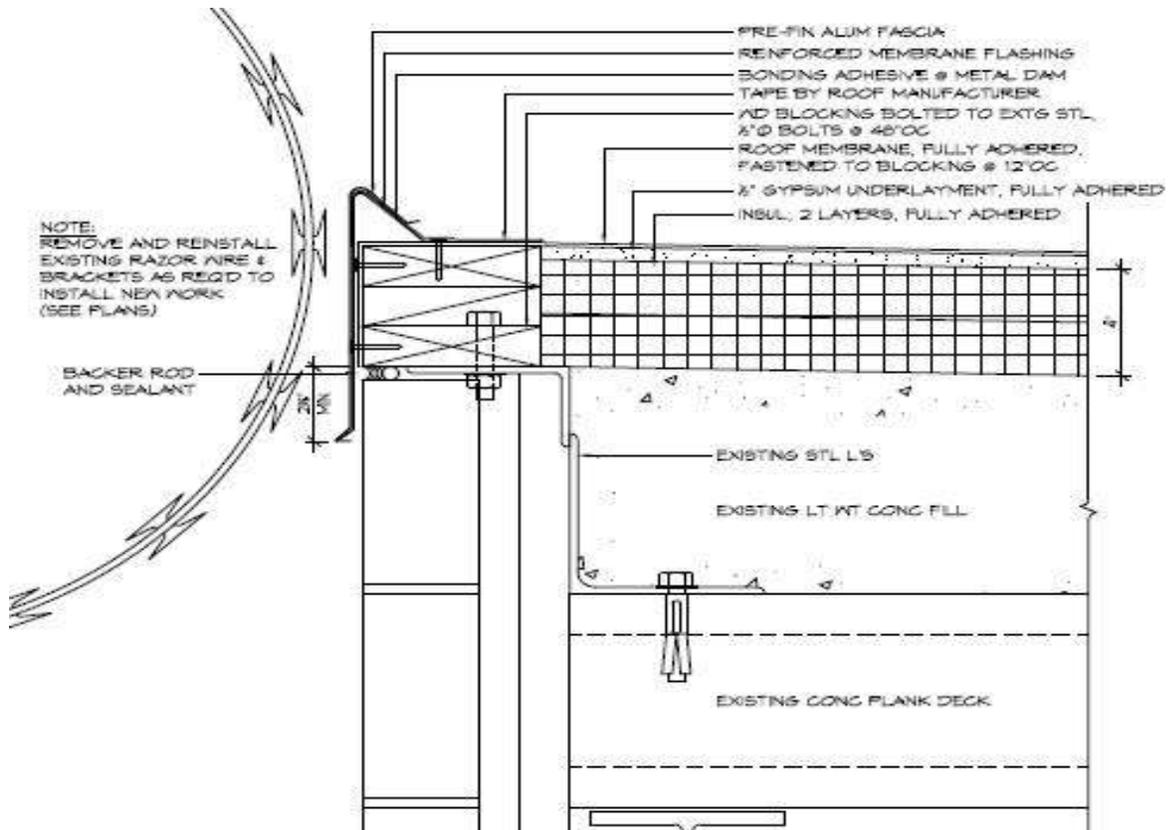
Roof Edge Detail for Units 1-3 with 8 inches of Concrete Fill
